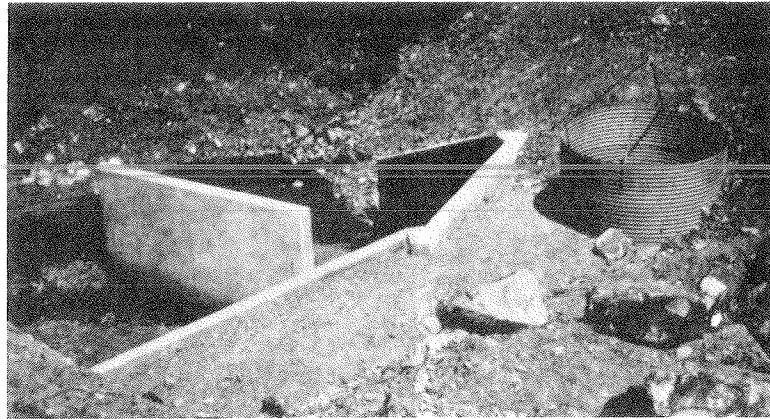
Debris fin and metal pipe debris riser in conjunction with single barrel culvert.
